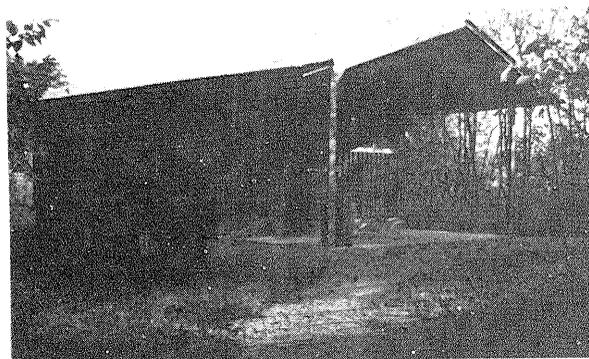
A rigid-frame cabin made from hardwood lumber.
